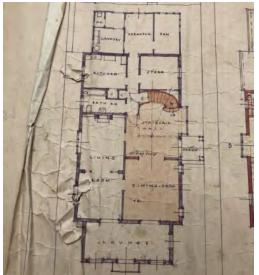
Floor plan of 69 Hopetoun Avenue Vaucluse (State Library of NSW)
